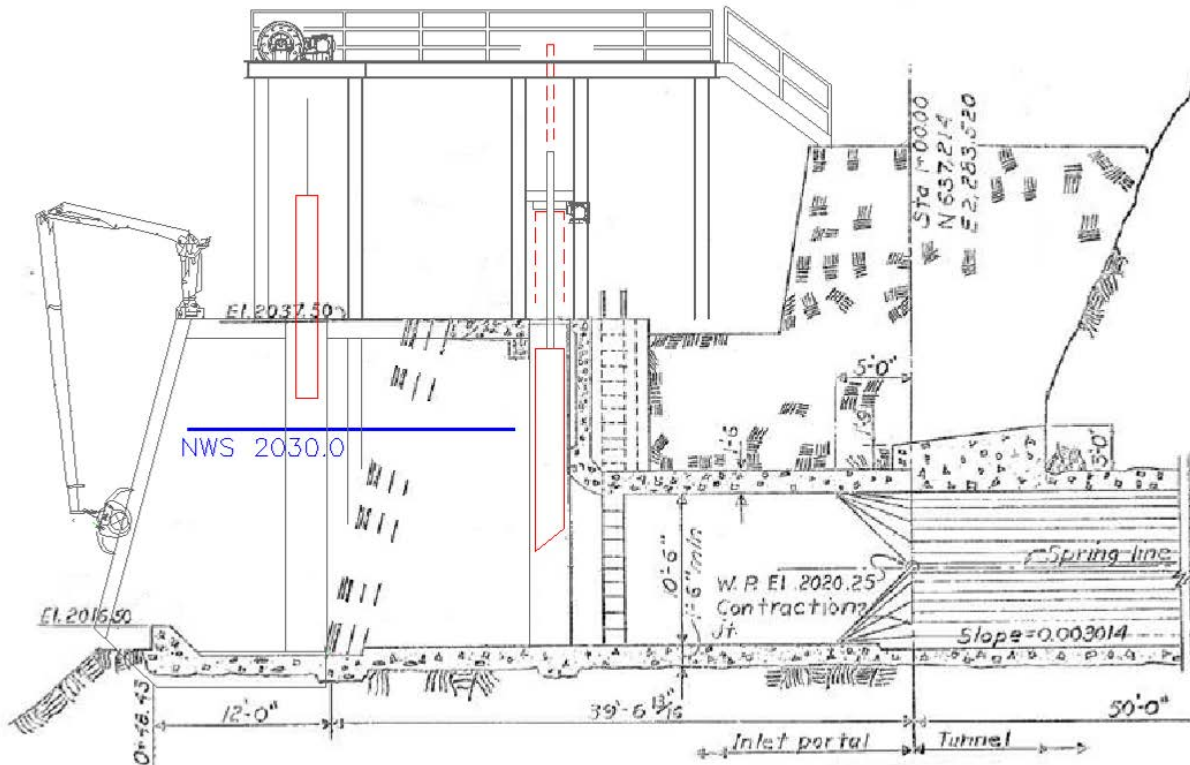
Concept-level details of YCWA's proposed Lohman Ridge Inlet Control Gate and Debris Rake.
